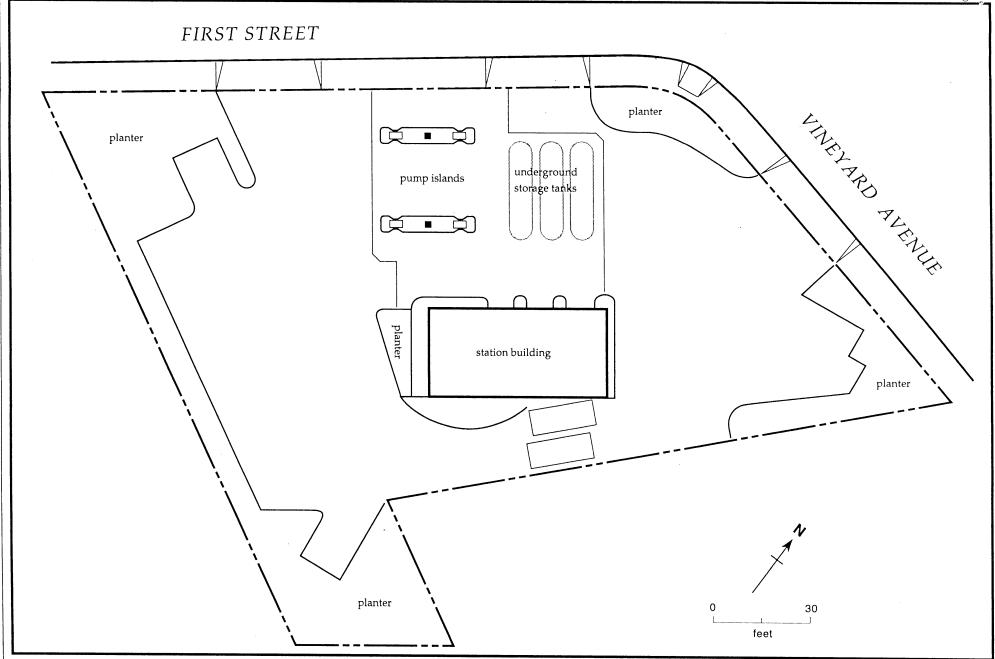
Site Layout - Shell Service Station WIC #204-6138-0303 - 4226 First Street, Pleasanton, California
